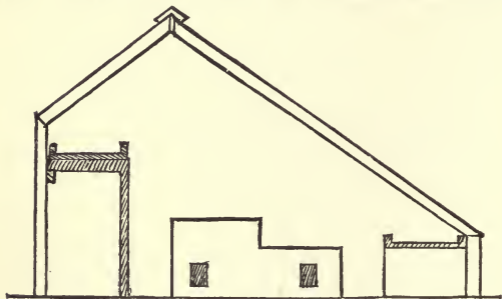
(Scale $\frac{1}{8}$ of an inch to the foot.)
